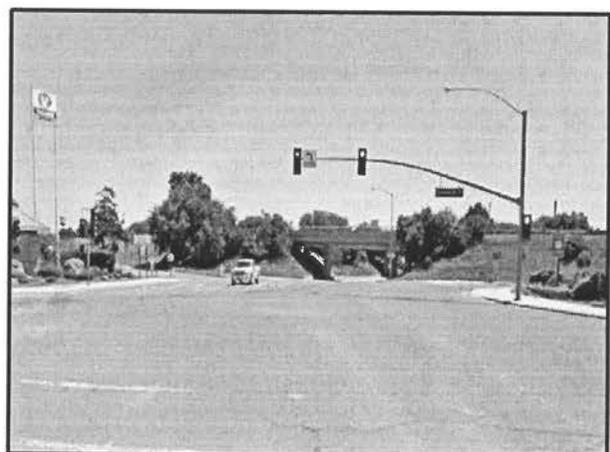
Study Area at intersection of San Antonio Drive and San Lorenzo Park Road, facing south, June 26, 2020.
